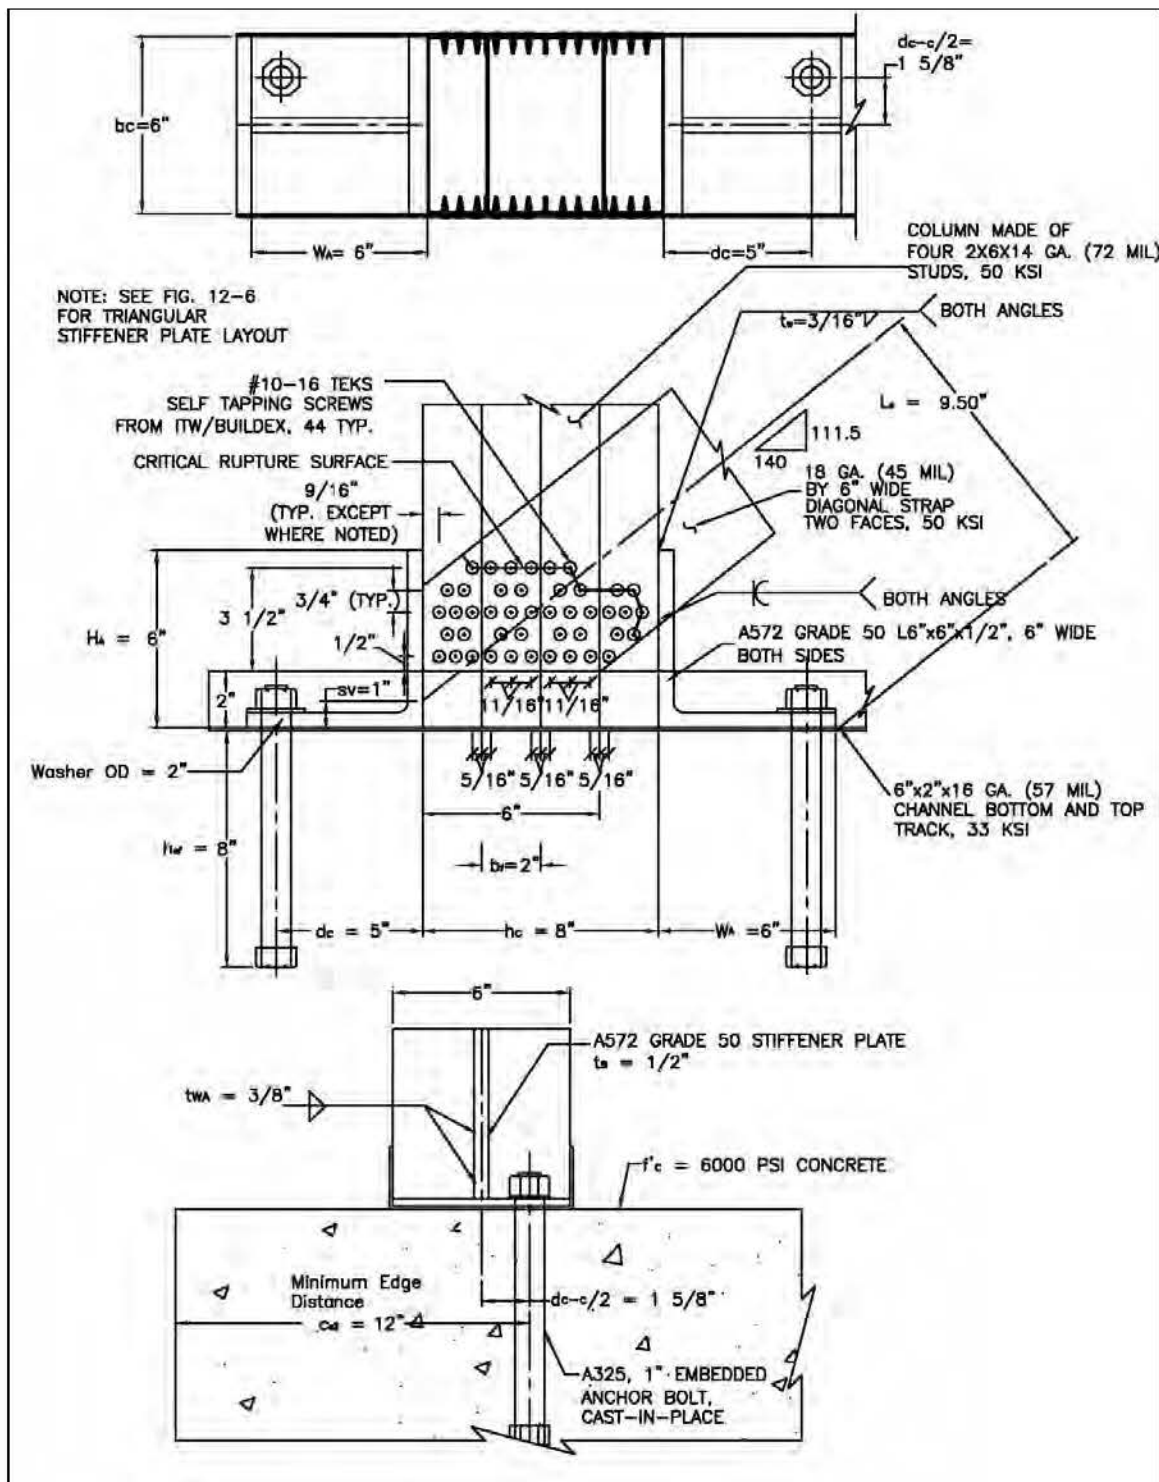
Example connection/anchorage detail (eighth row of Table 12-6 and Table 12-9 through 12-22).
